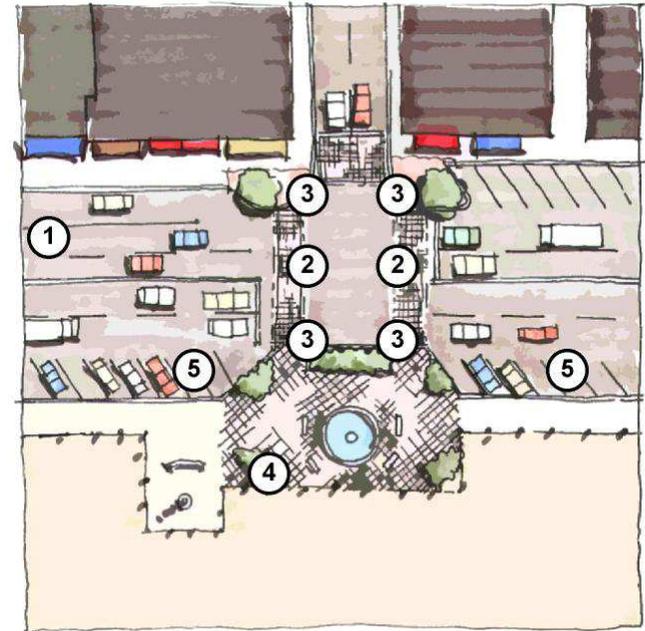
Reconstruction of the Highland Avenue/Ocean Boulevard Gateway
